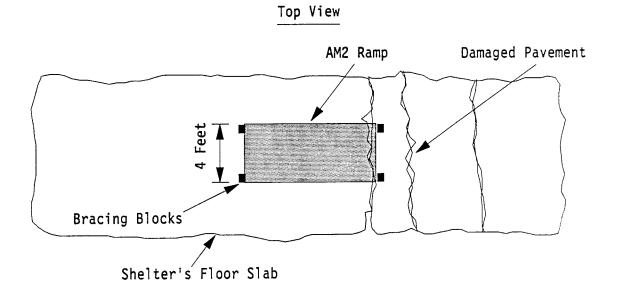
AM2 Aircraft Shelter Floor Slab Ramp Repair.
